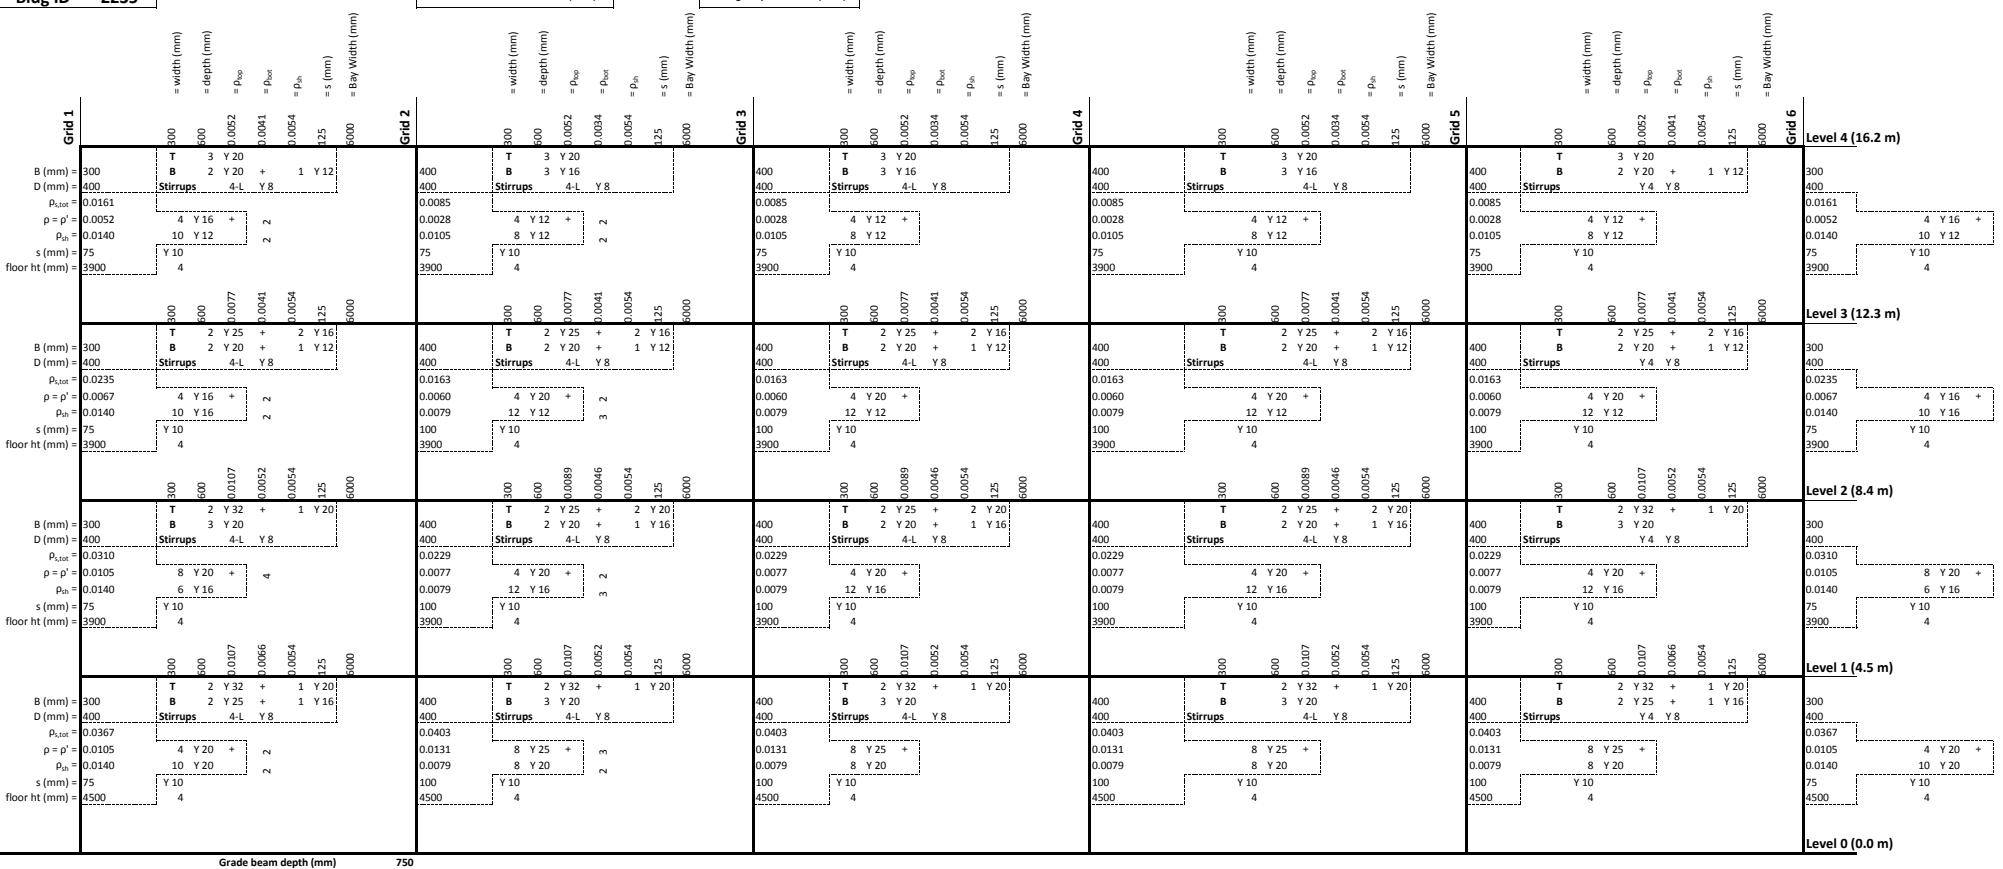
Provided reinforcement and modeling details for building ID 2235
